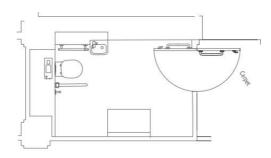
Proposed layout of converted kitchen/dumb waiter
